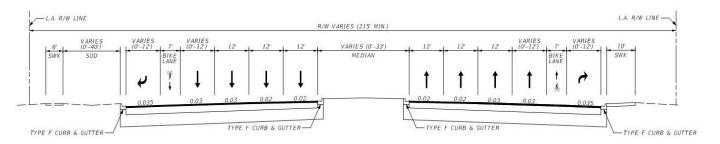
Proposed Typical Section - SR 70/Okeechobee Road over SR 9 / I-95
